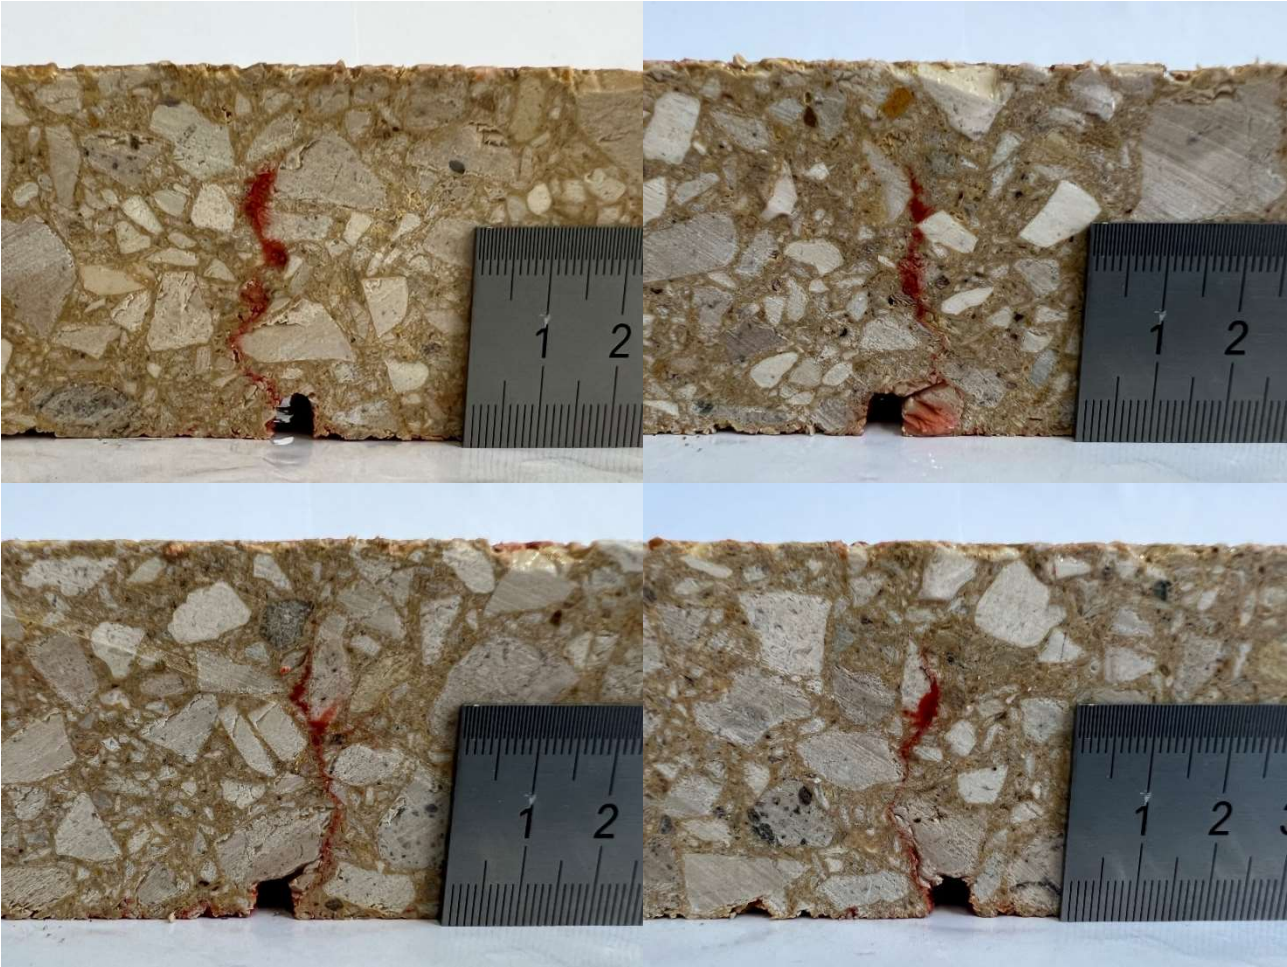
Photographs of the cracking in the AC Low Damage Level beam
